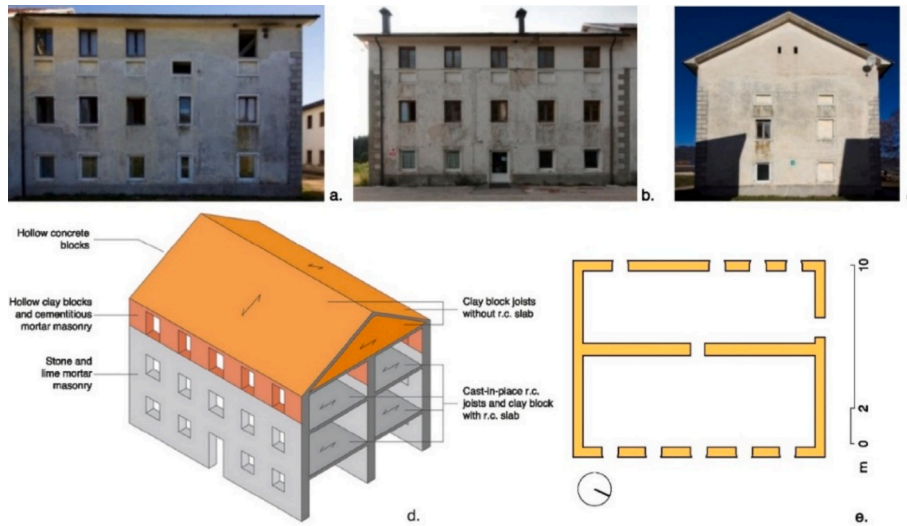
“Cattedra” pilot case: a) East longitudinal façade [21], b) West longitudinal façade [21], c) South transverse façade [21], d) structural scheme, e) typological plan.
